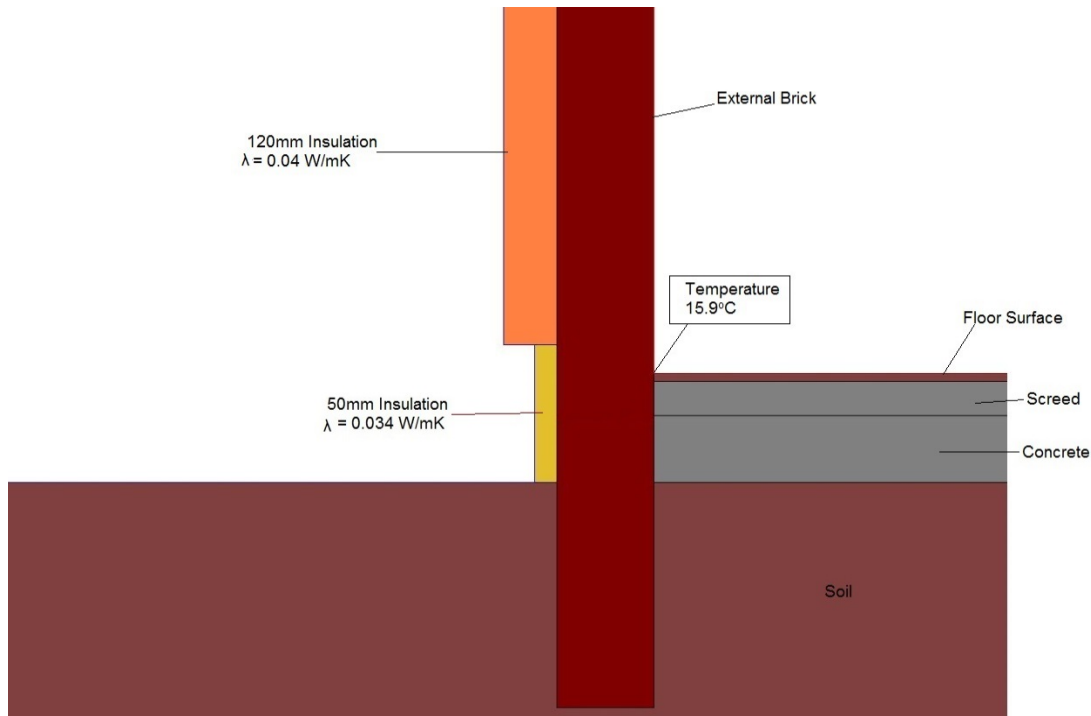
Junction between an uninsulated concrete ground floor and a wall insulated externally (typology R9) with below DPC insulation
